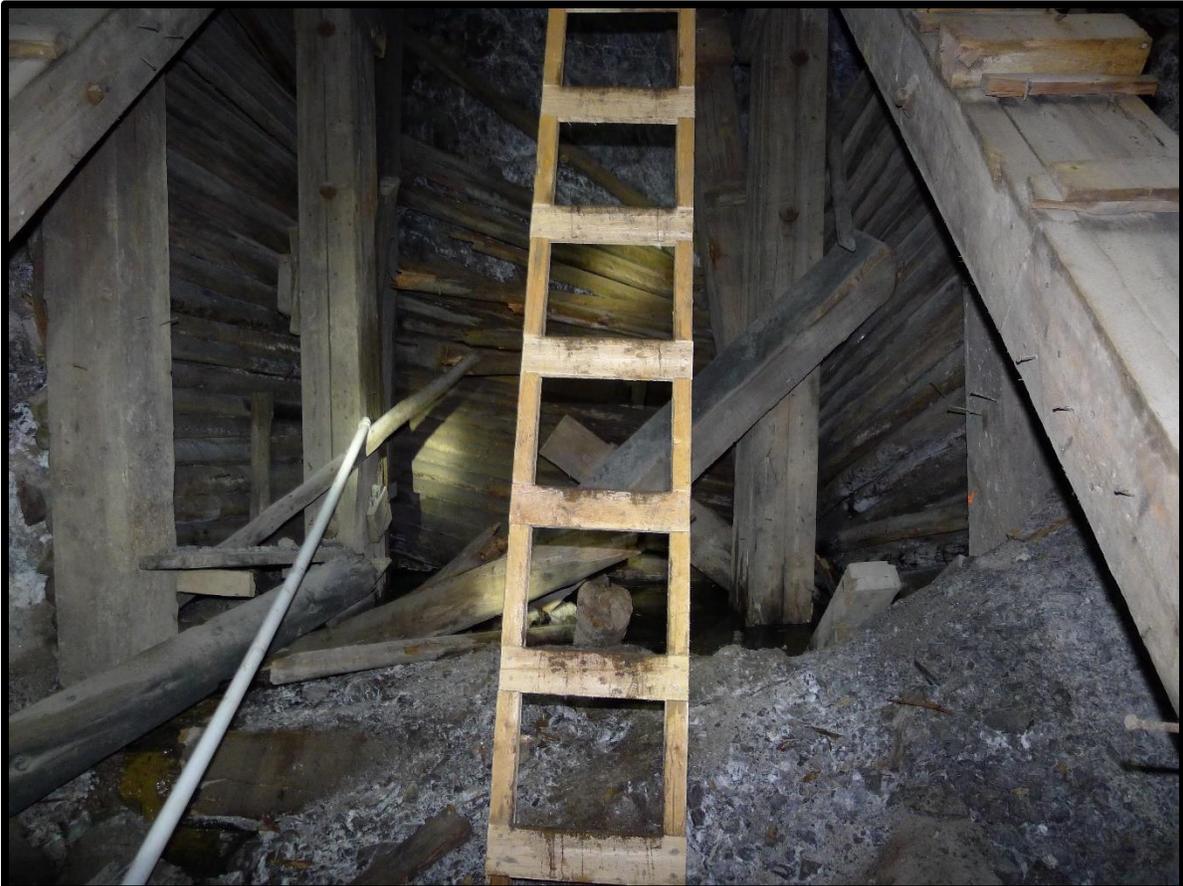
Bachelor Shaft at Nelson Tunnel landing
